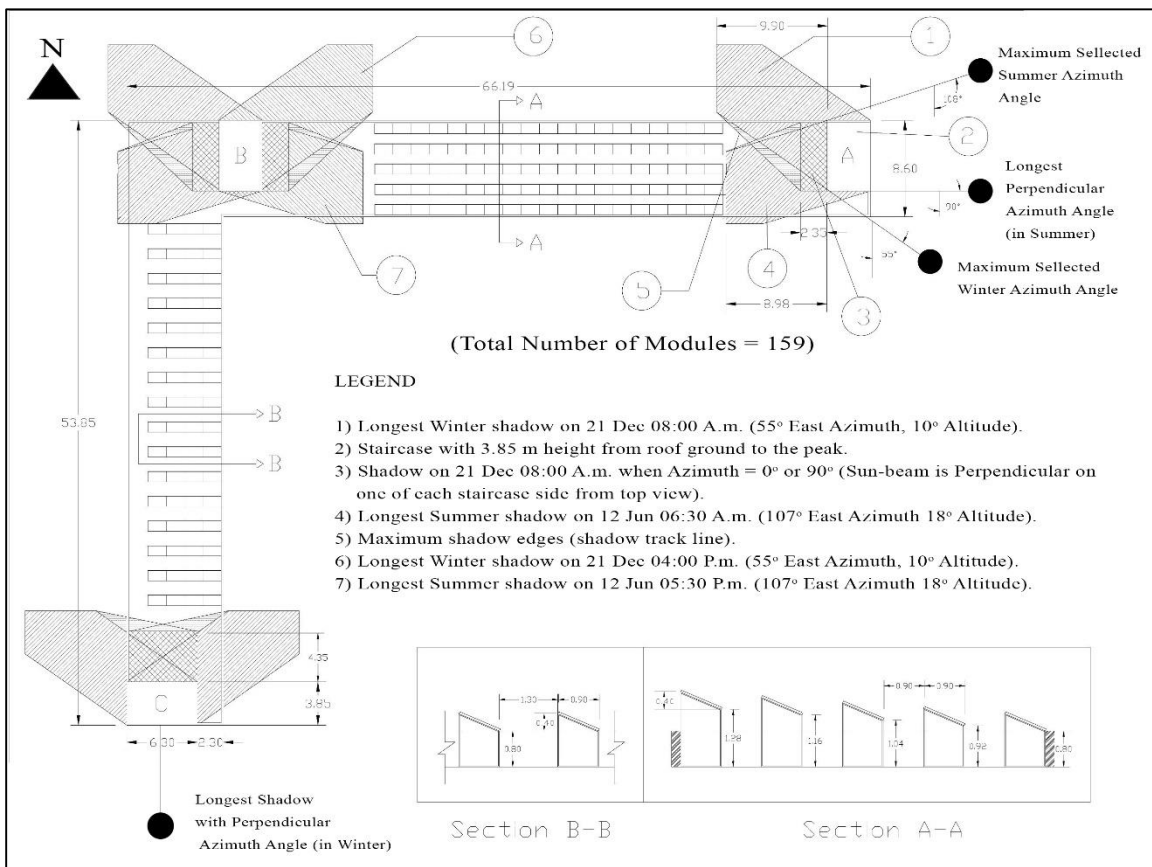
Maximum number of modules that could be mounted on school's roof
